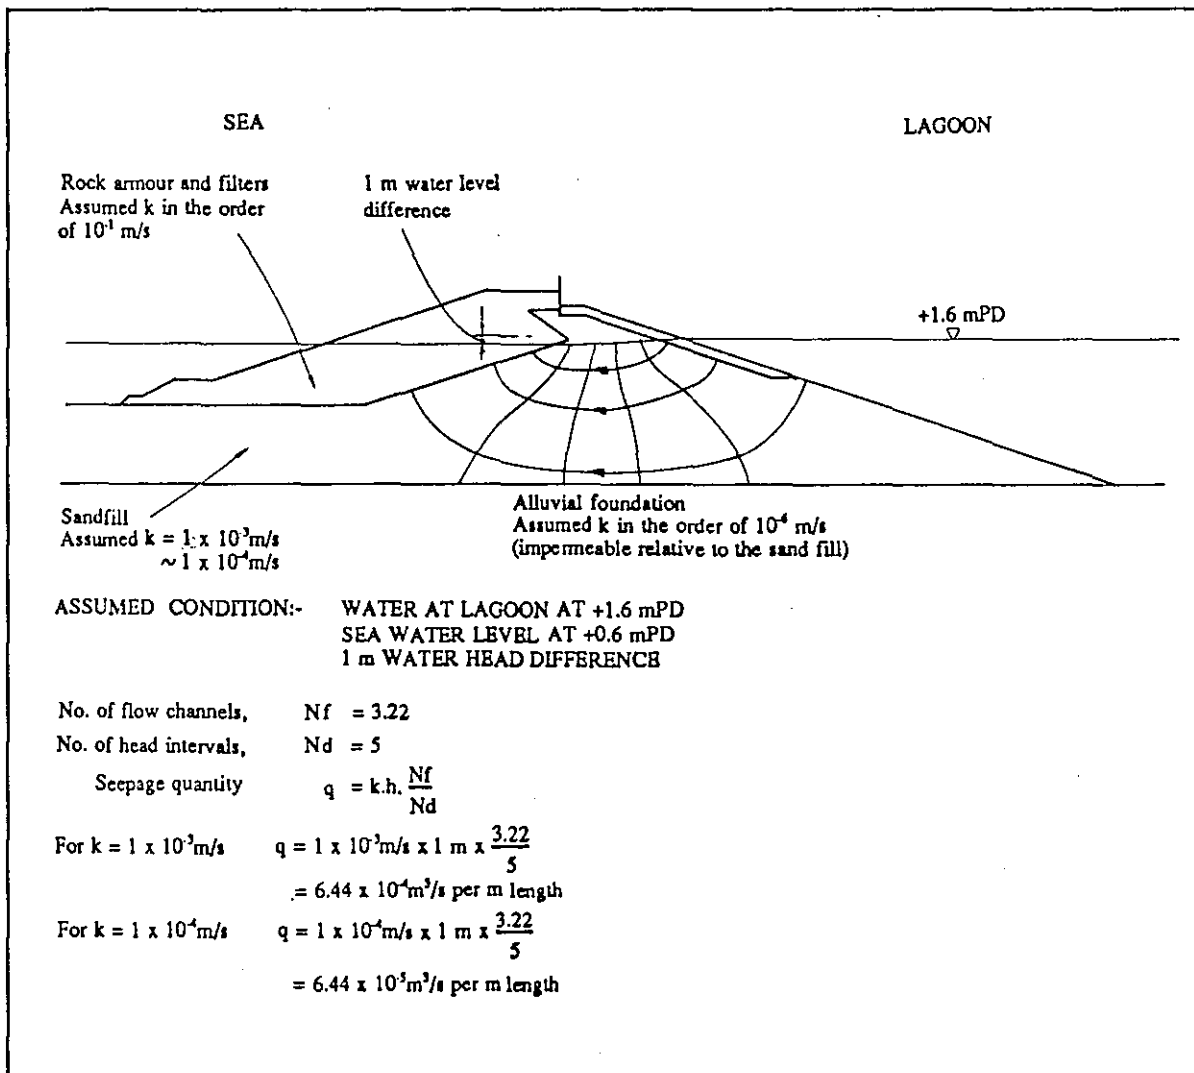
Seepage Flownet Through Typical Embankment Section (From Lagoon To Sea)
